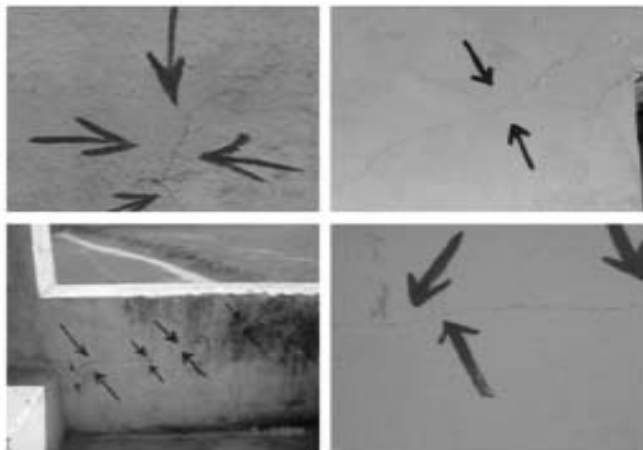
View of the minor damage at second floor of the RCC structure at Sonepur Bazari mine
